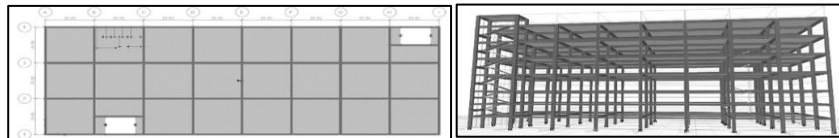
Plan & Elevation of the ETABS Model of the Building.
